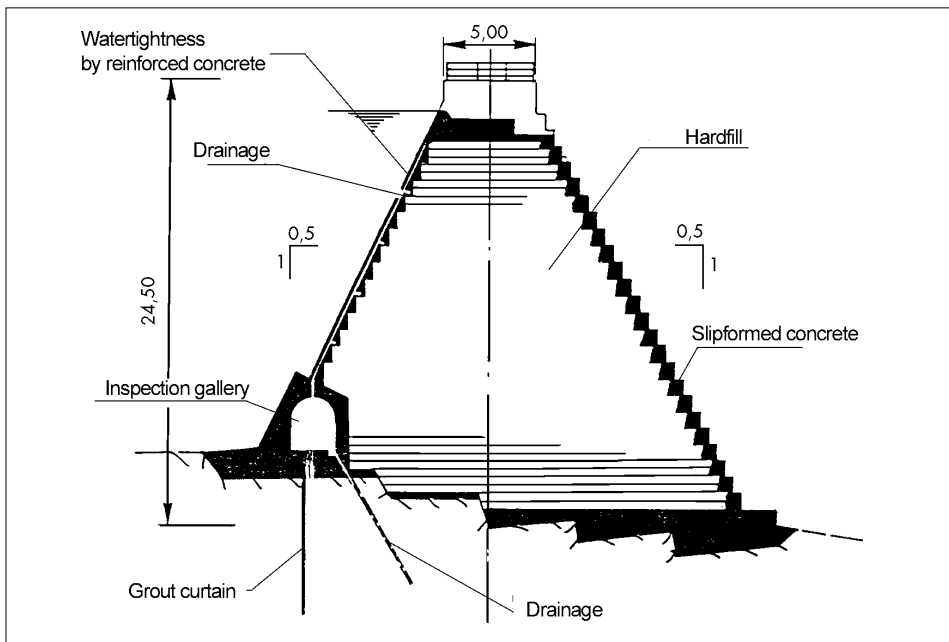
Typical cross-section of MYKONOS 1 dam with a symmetrical cross-section
